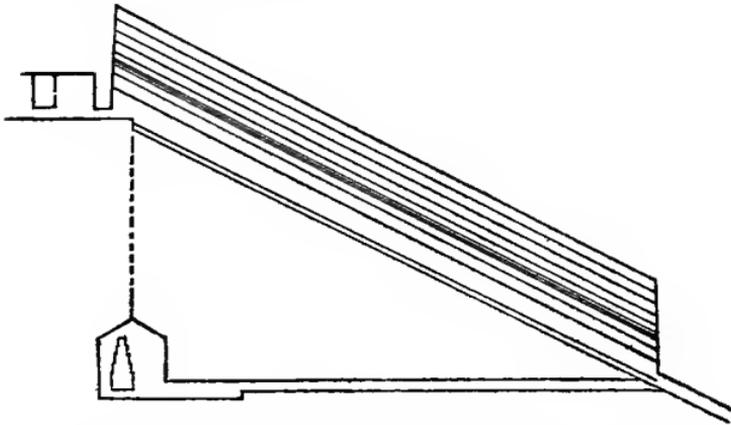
ELEVATION OF THE QUEEN'S CHAMBER AND GALLERY.
